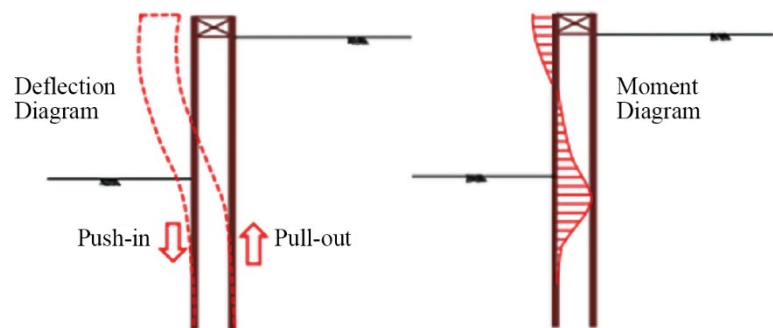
Behavior of Retaining System by Double-layered Sheet Piles
